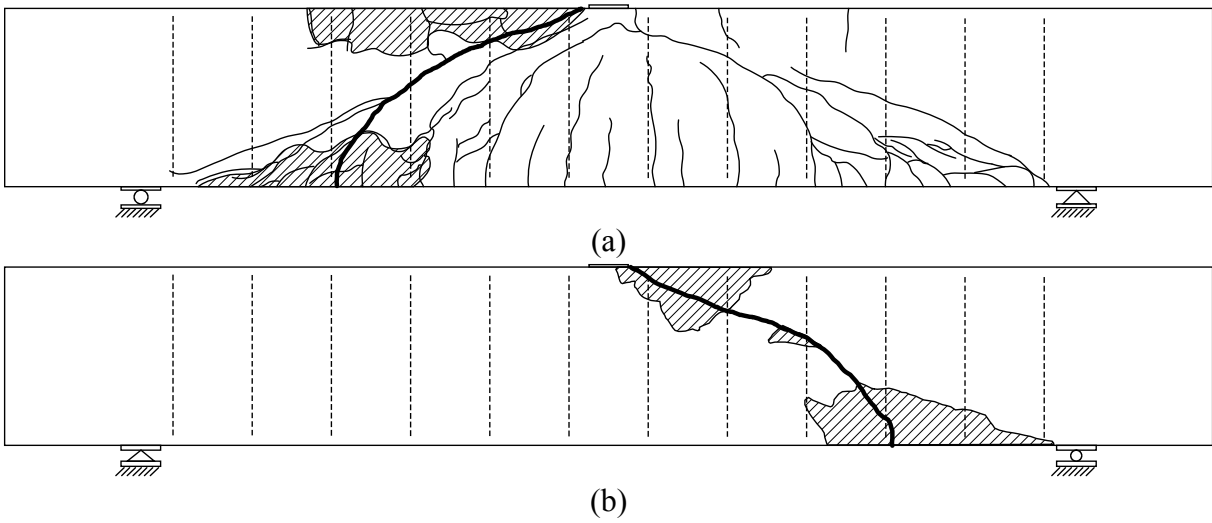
Observed damage in specimen P1S17, (a) front side, (b) back side
